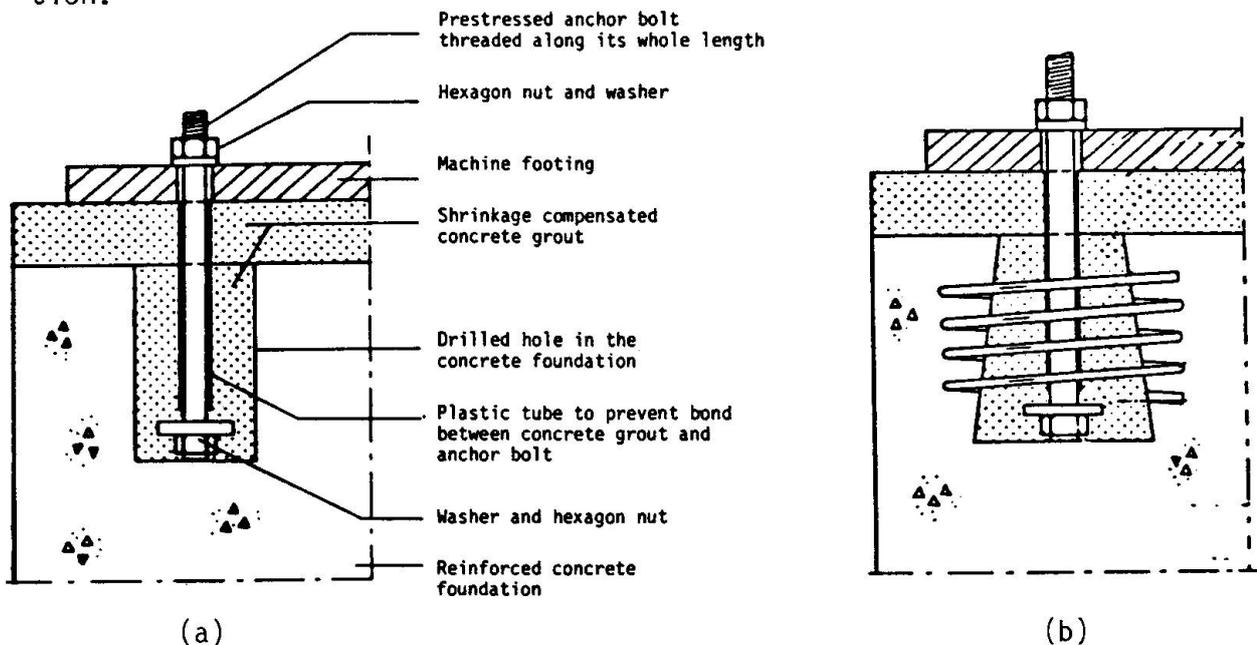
Tested anchor bolts. (a) Bolt placed in a cylindrical hole drilled into a reinforced concrete foundation. (b) Bolt placed in a cylindrical recess. The recess is formed by a 0.5 mm thick metal sheet
